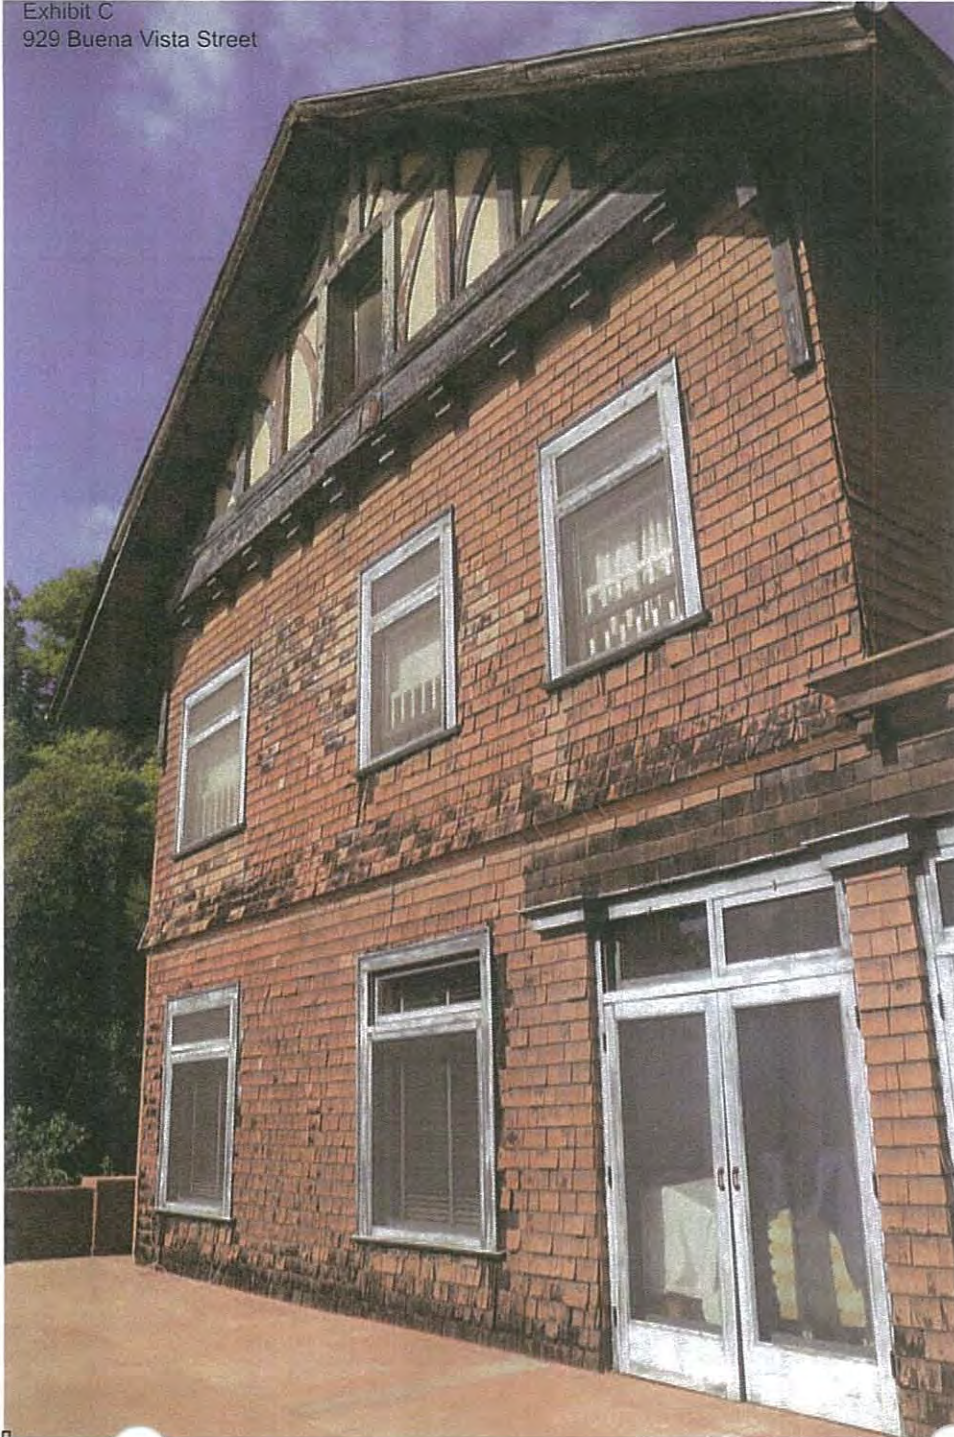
South elevation. Example of carpentry repairs needed. South perspective.
